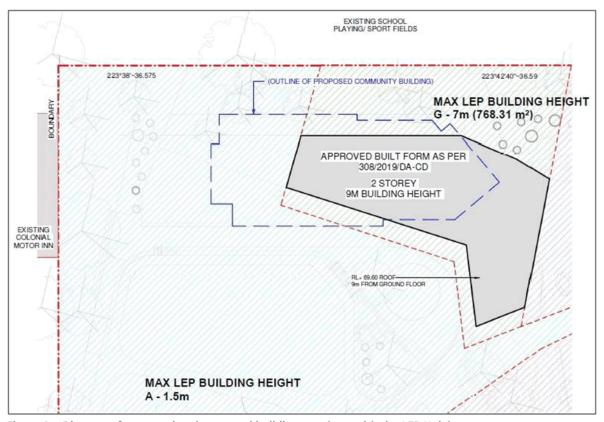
Diagram of approved and proposed building envelope with the LEP Height zone.
